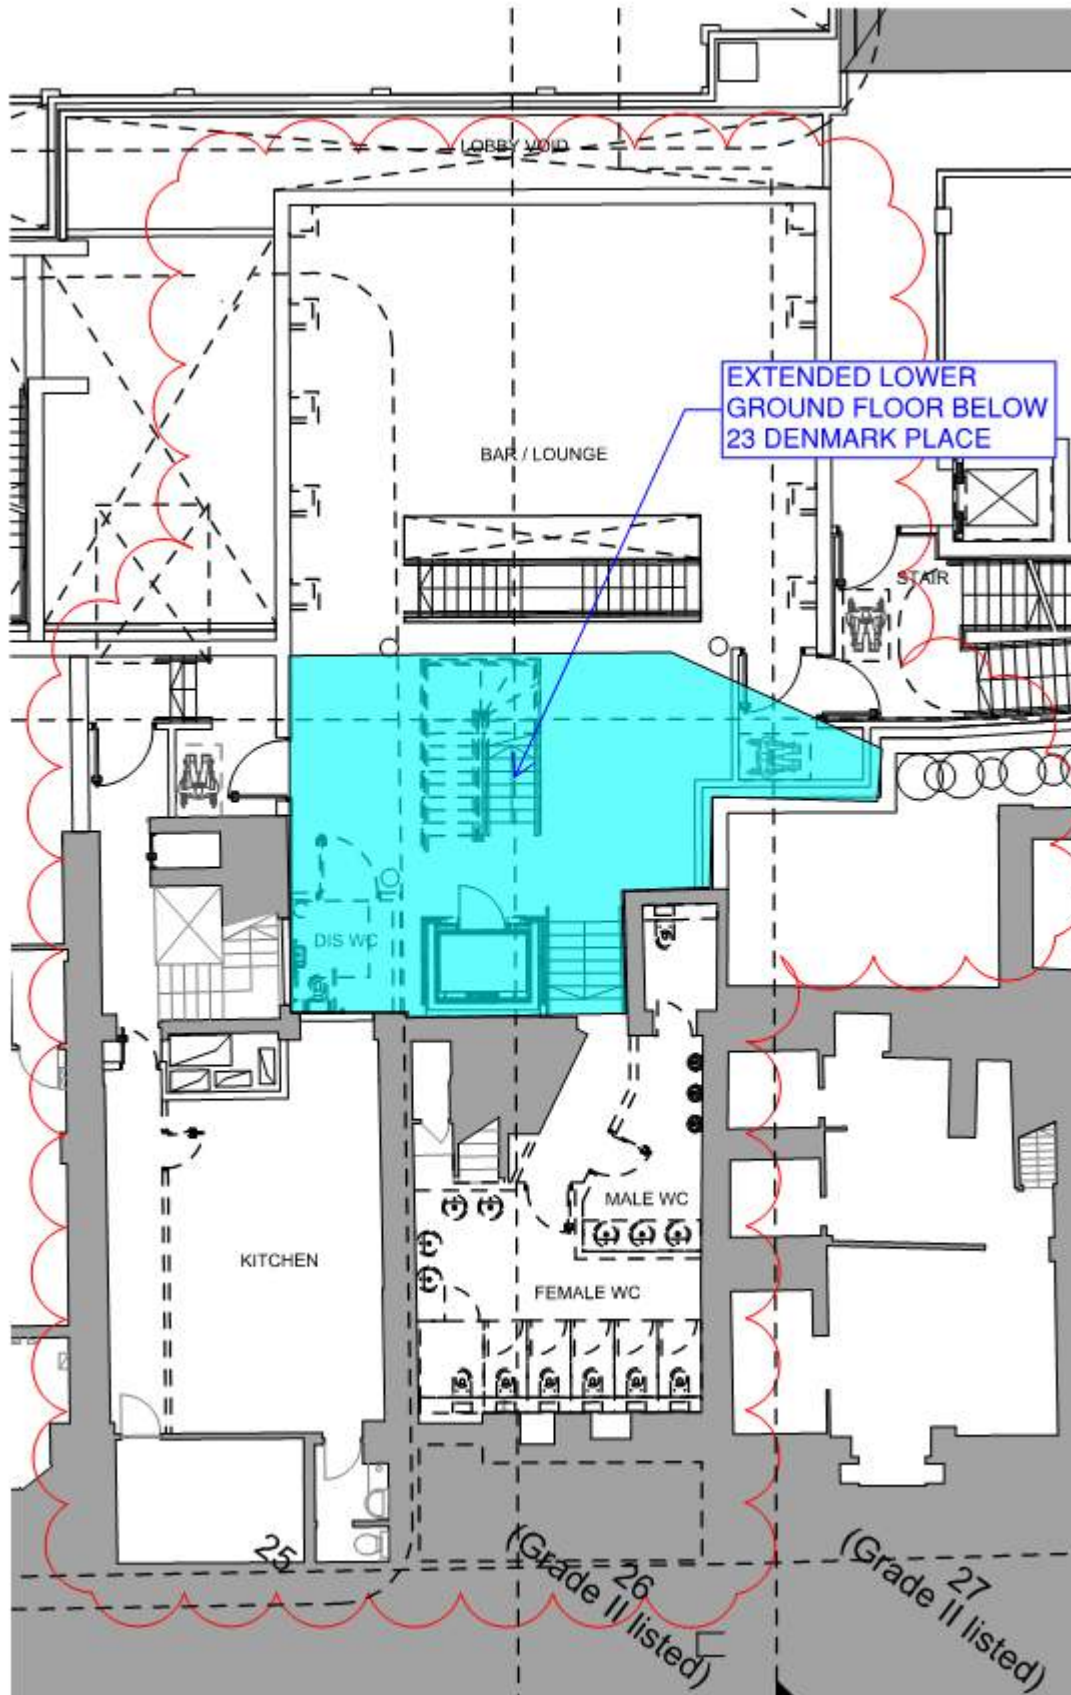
Extended Lower Ground Floor below 23 Denmark Place.
